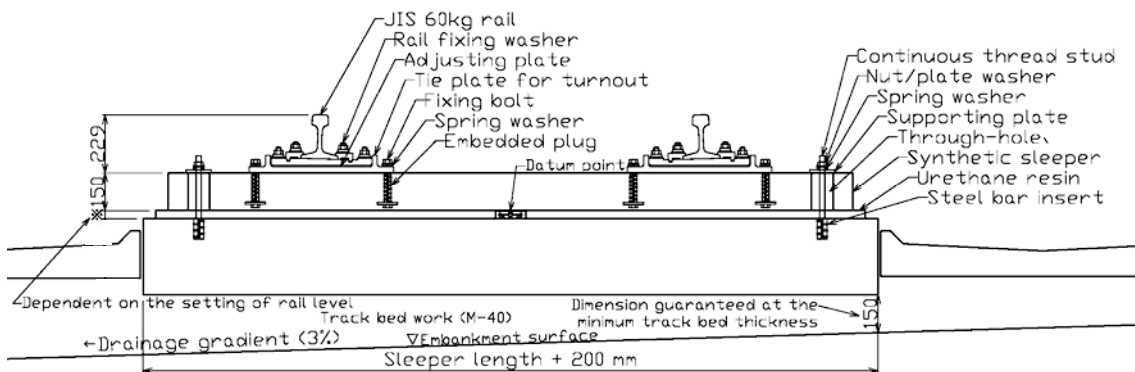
Standard Cross-section of the Track Structure at Turnouts in Embankment Sections.
